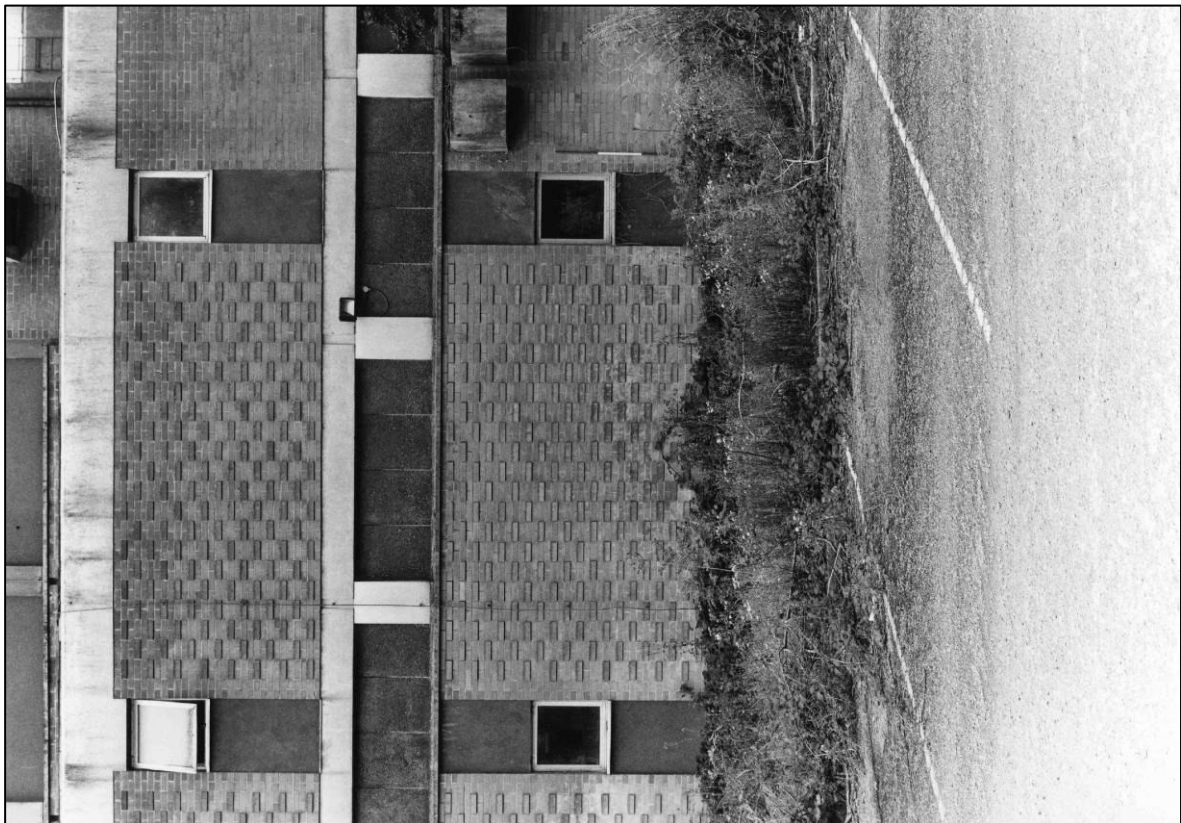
Control Centre complex, brickwork detail in central part of E elevation, looking SW (photo 7/14) (top to left).
